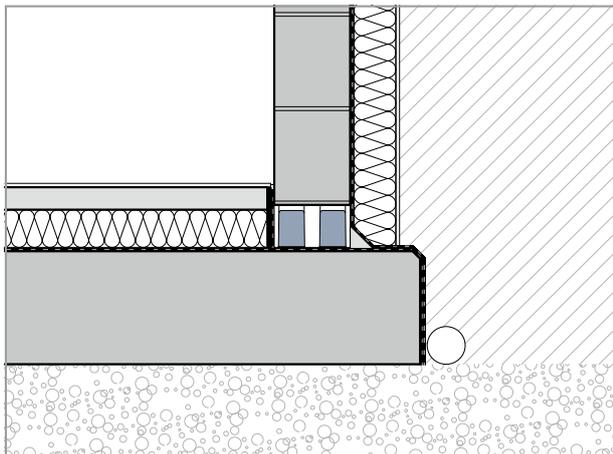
Schöck Sconnex® type M external wall on foundation component
